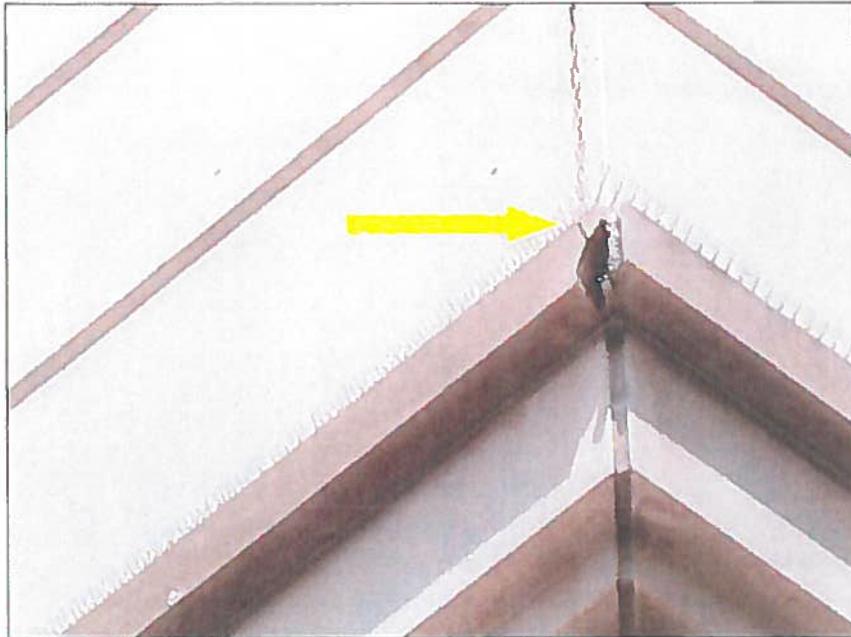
Spalled limestone at the cornice quirk miter joint between the third and fourth floors.
